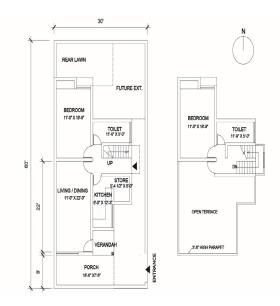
Ground- and first-floor plan of LDA House (Source: the author of the paper)
